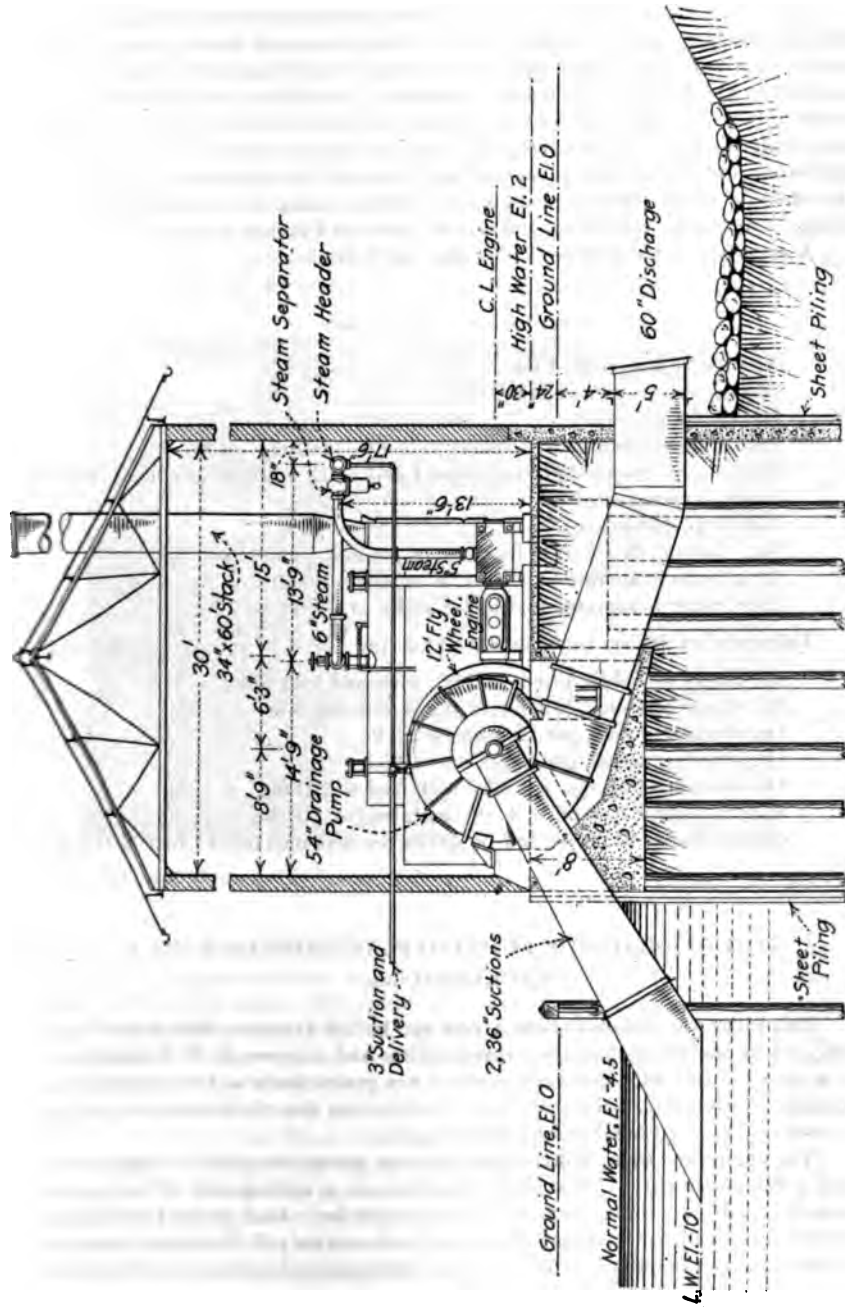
ELEVATION OF WHITELAKE PUMPING PLANT
